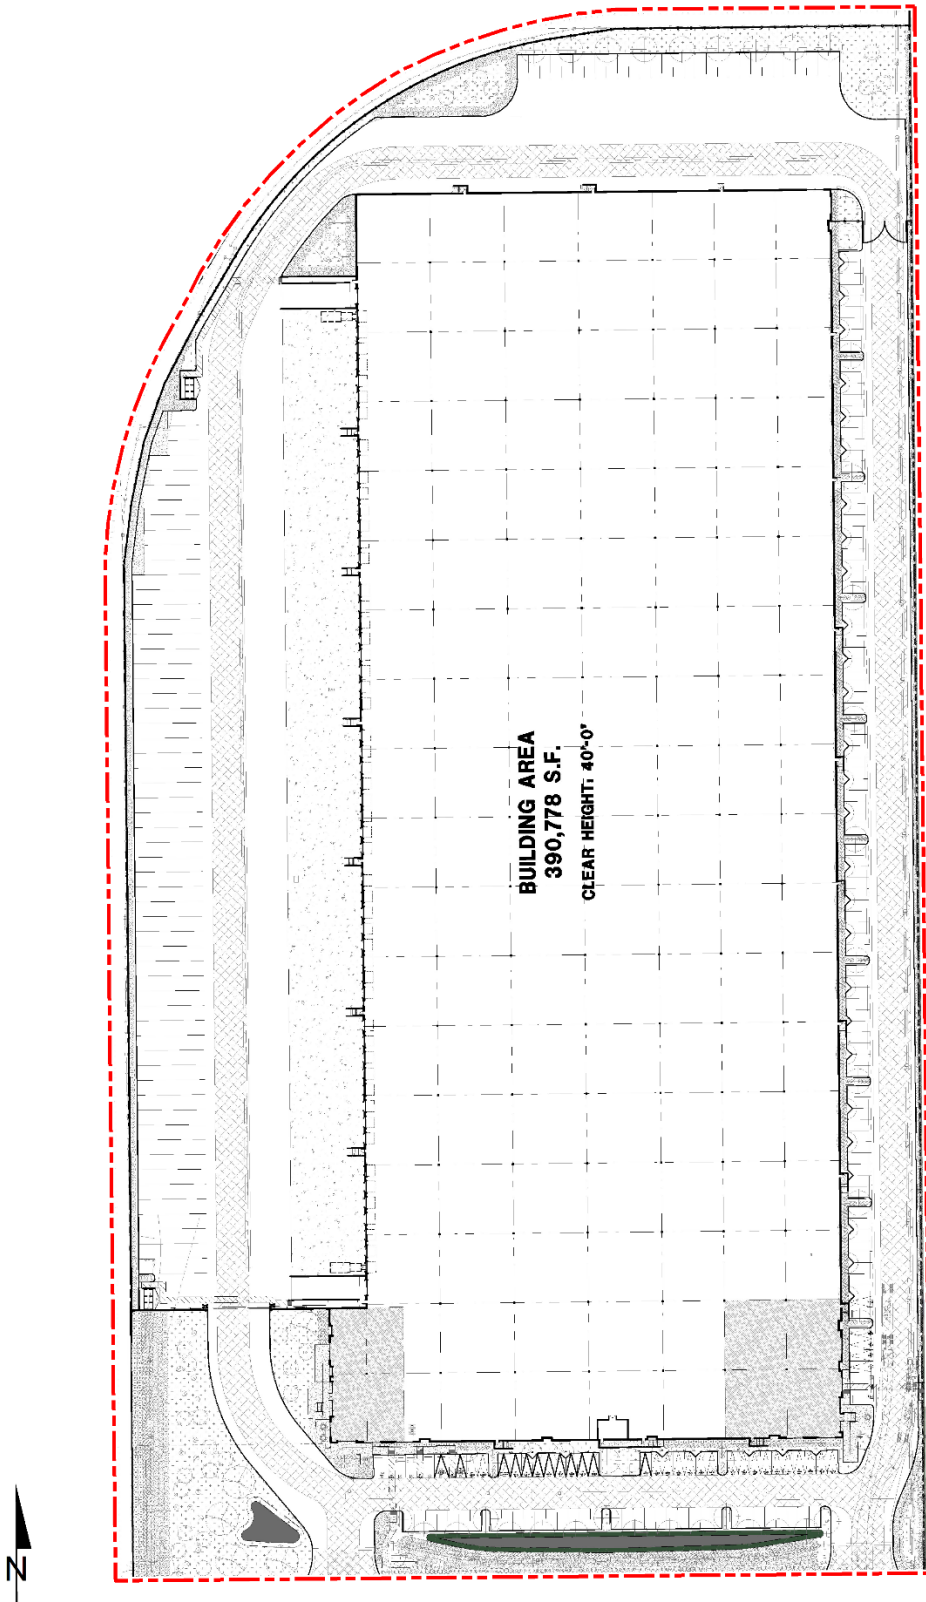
B: PRELIMINARY SITE PLAN
